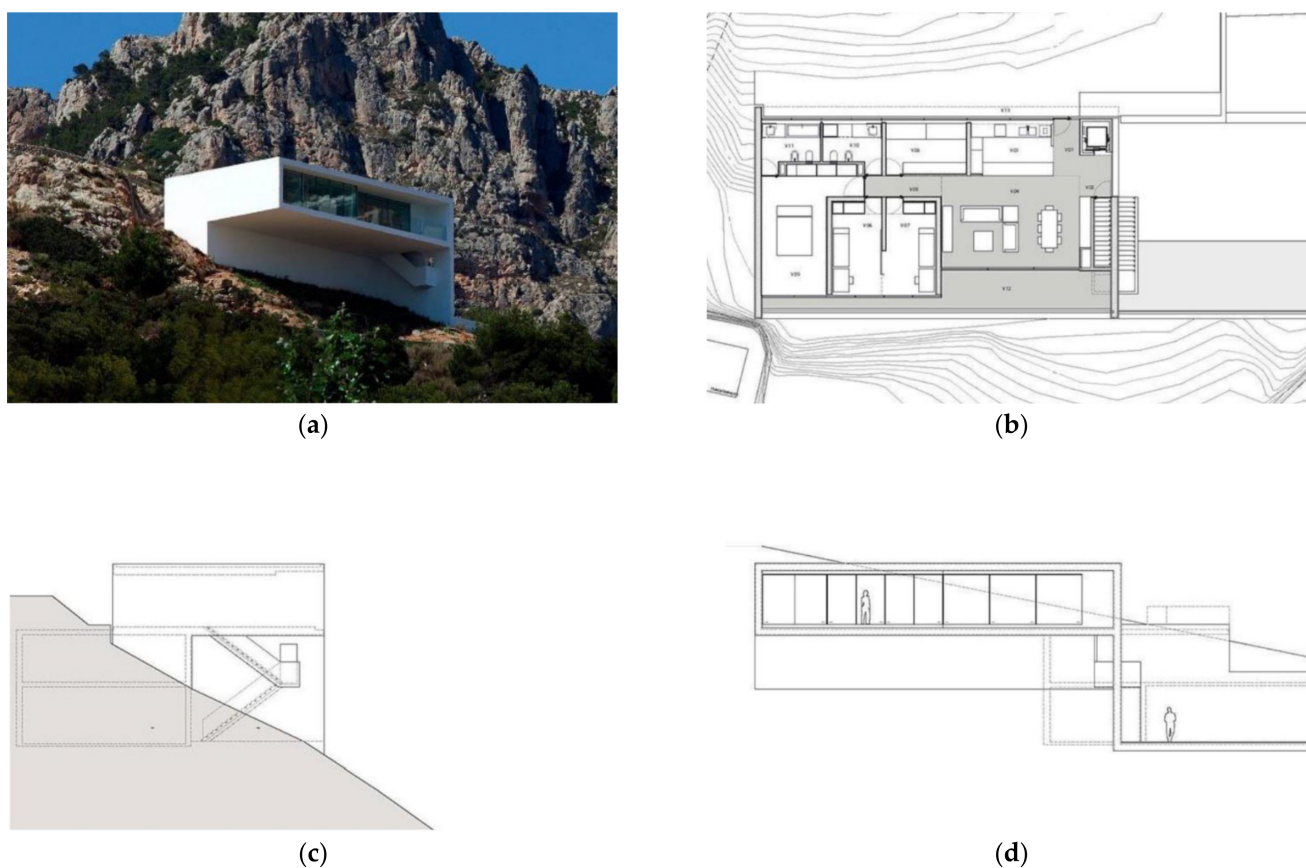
House under study: (a) external image; (b) floor plan; (c) southwest elevation; (d) southeast elevation.
